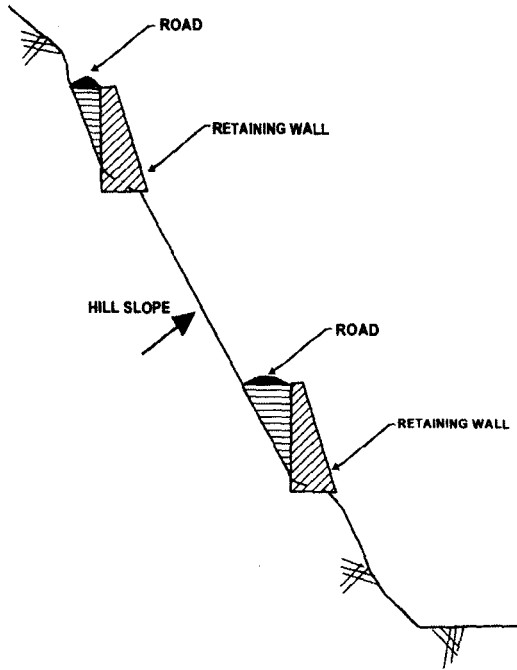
Possible Situation for Application of Retaining Wall with Reinforced Backfill
